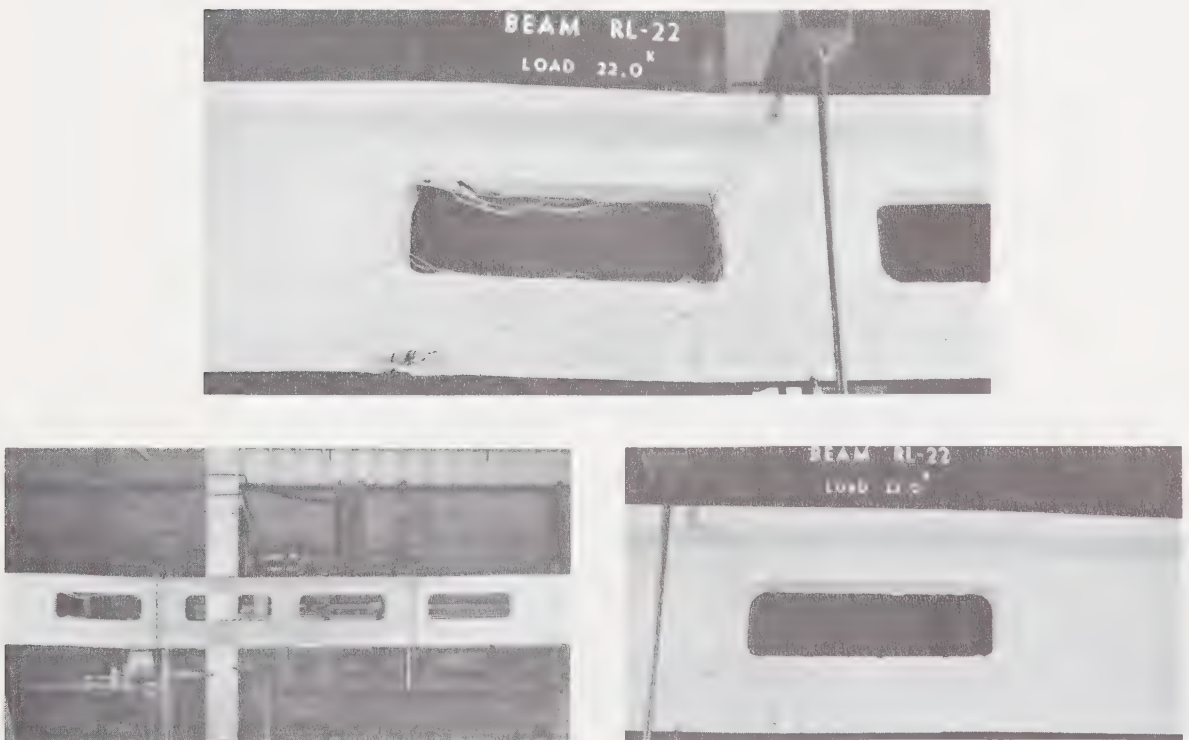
CRACKING AND FAILURE PATTERN OF BEAM 22-26-5
